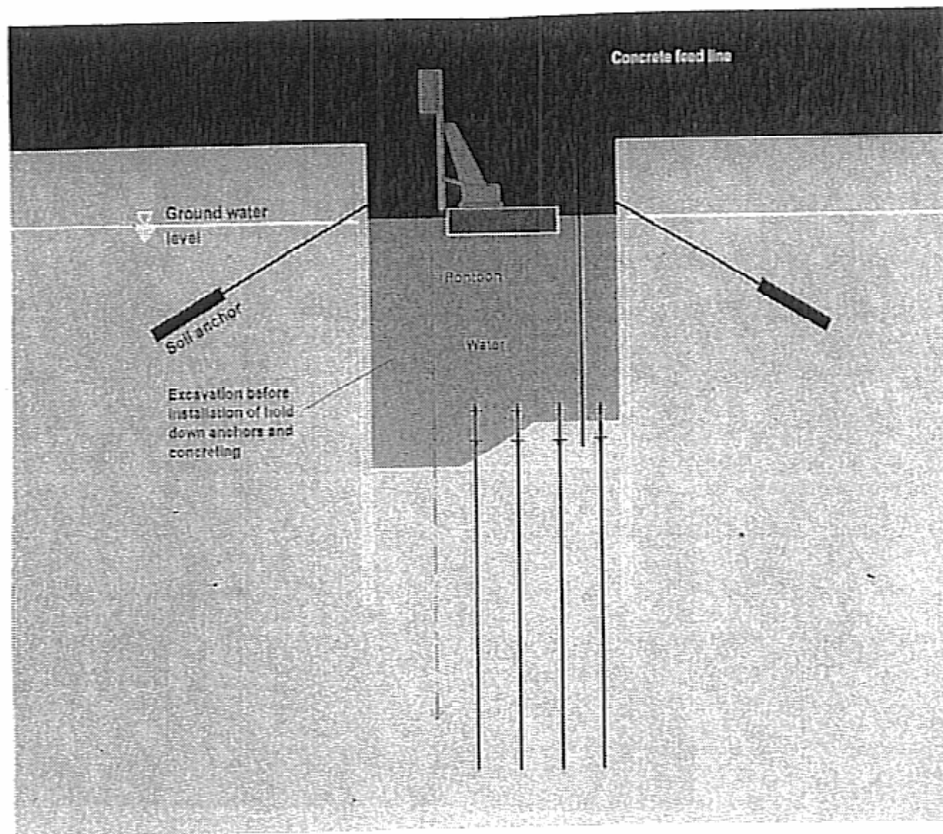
Underwater concrete slab with micropiles for tension reinforcement
